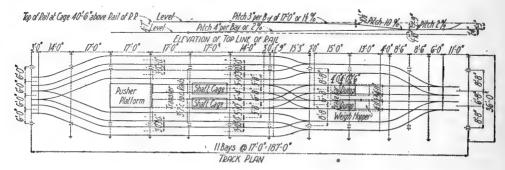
PLAN OF TIPPLE TRACKS, SPRING VALLEY NO. 5 COAL TIPPLE.
